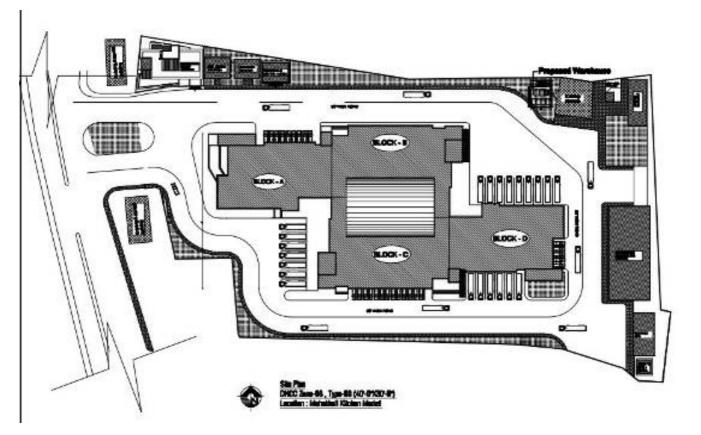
Layout Plan of the Proposed Sub-project at Mohakhali
